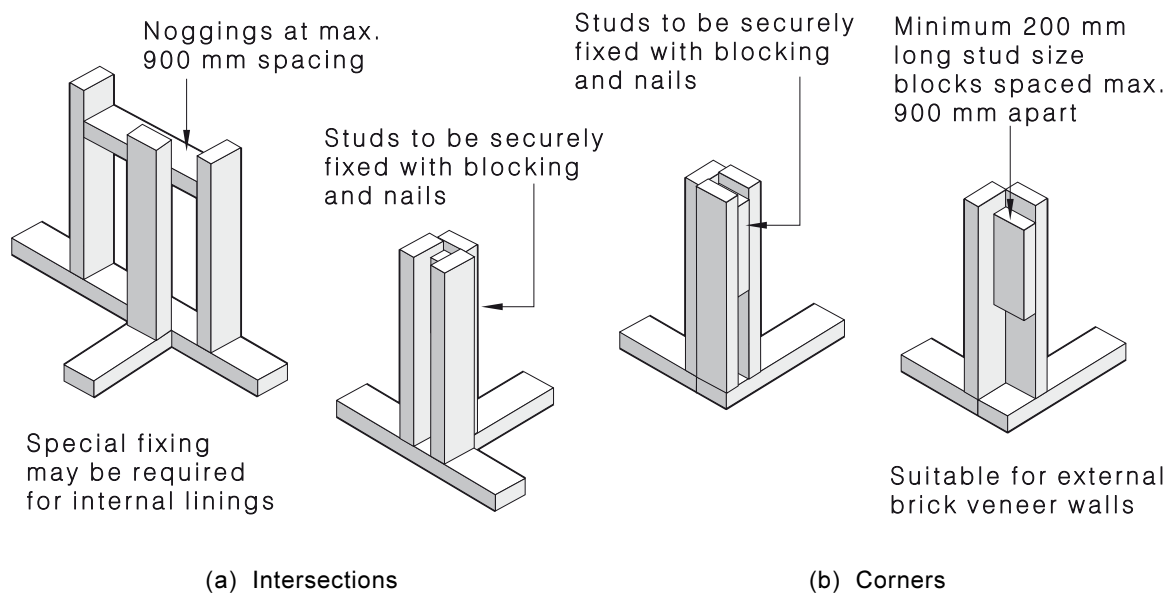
TYPICAL WALL JUNCTIONS
